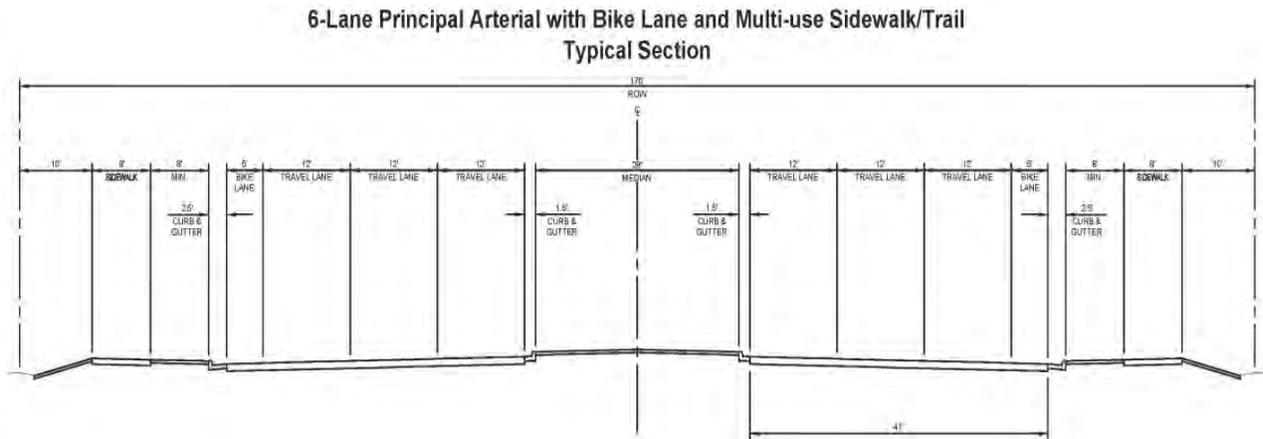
Cross-section of Modified Street Typology: 6-Lane Principal Arterial with Bike Lane and Multi-use Sidewalk/Trail
